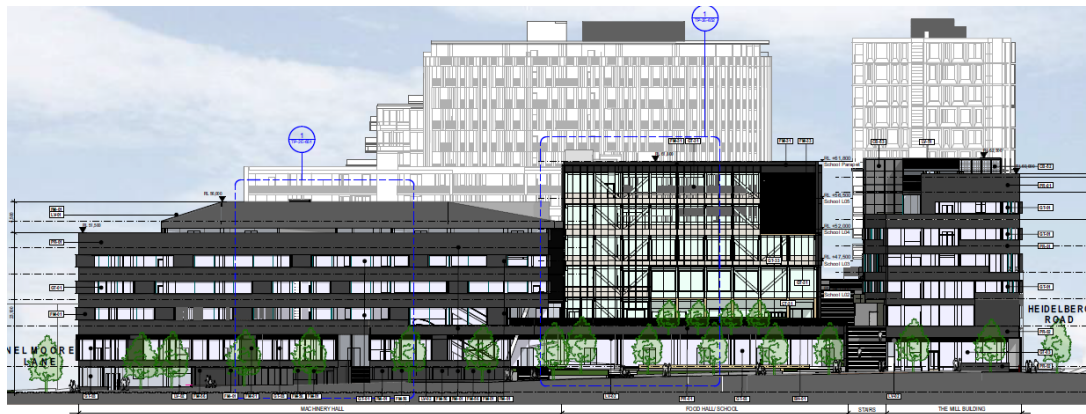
Previous amendment Mills Boulevard (Eastern) elevation
